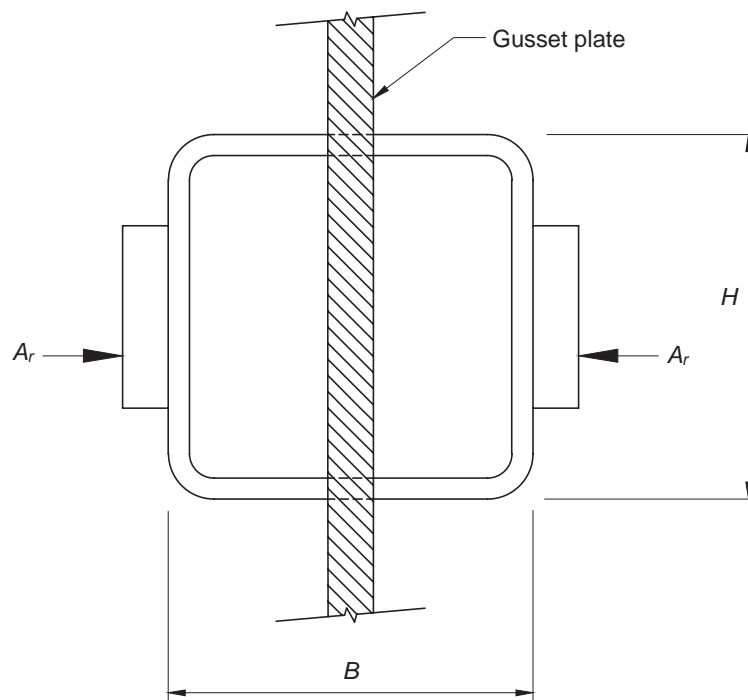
Section A-A: HSS section with reinforcing plates of area A_r .
